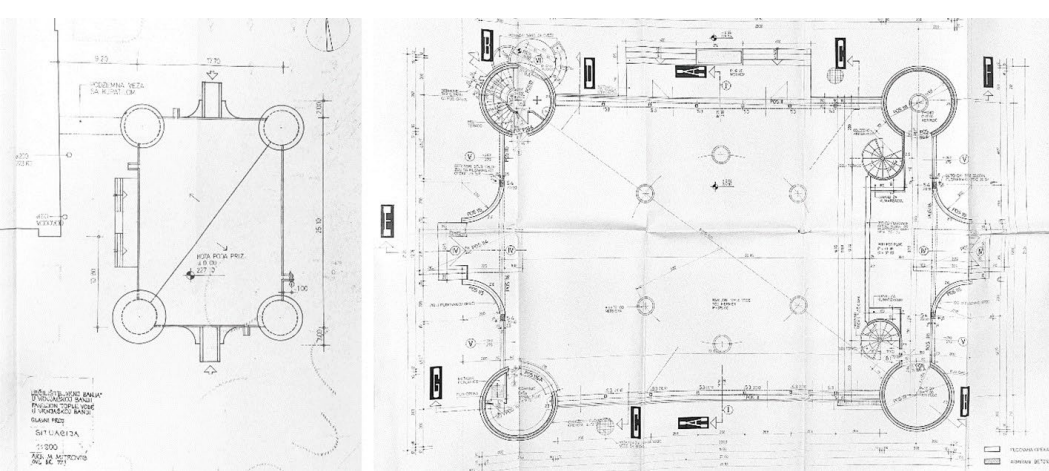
Situation and ground plan of the “Topla Voda” pavilion in Vrnjacka Banja. (Source: Historical Archives of Kraljevo, 2024)
